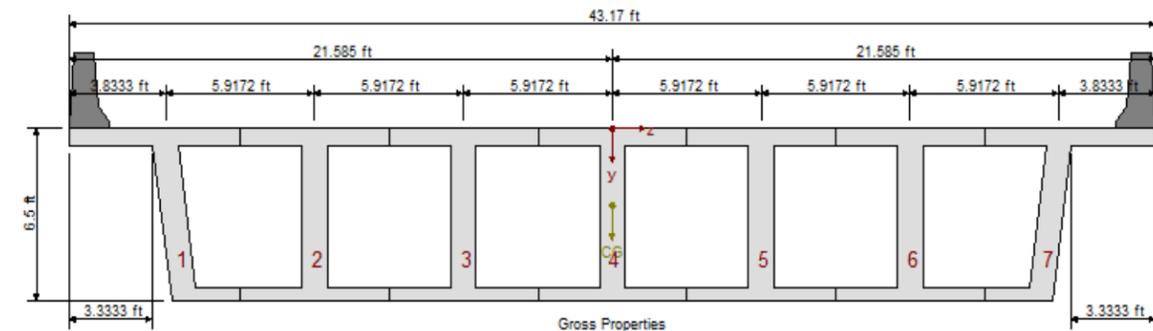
Flyover Ramps: EN, SE, NW, WN, WS over MC 85 - Typical Section
